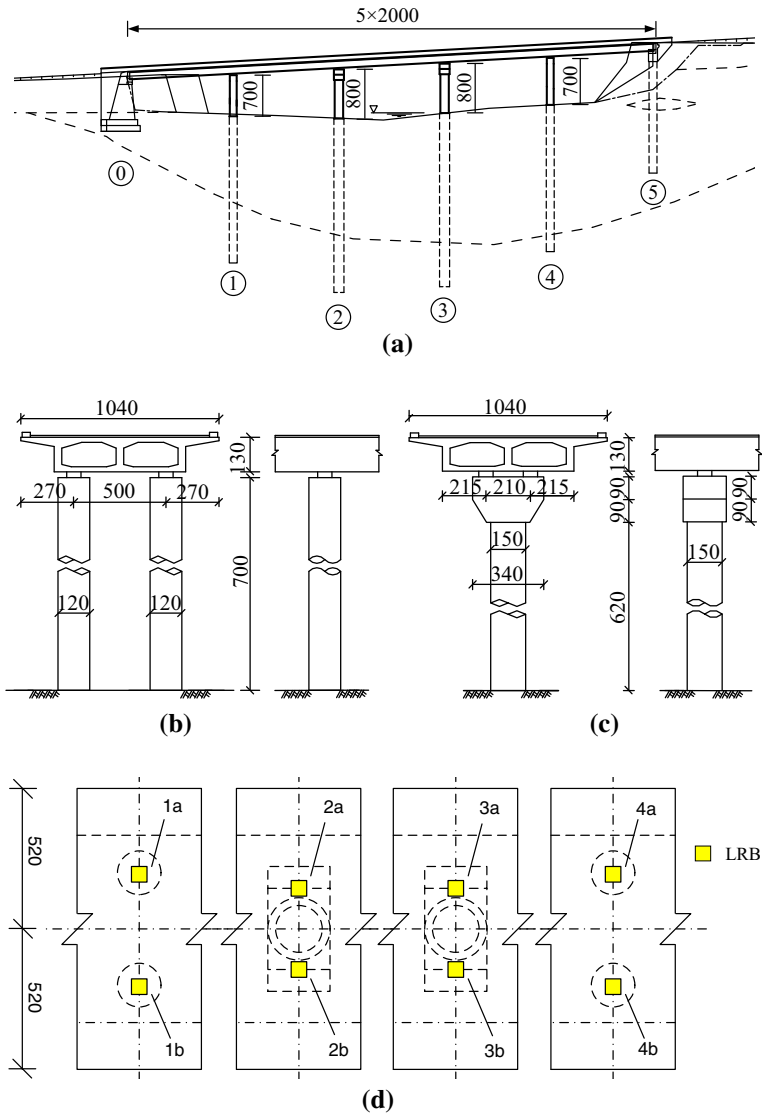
Geometric details of the seismic isolated continuous girder bridge. a Longitudinal view of the bridge. b Double column bridge pier. c Single column bridge pier. d Arrangement chart of LRBs on the top of bridge piers
